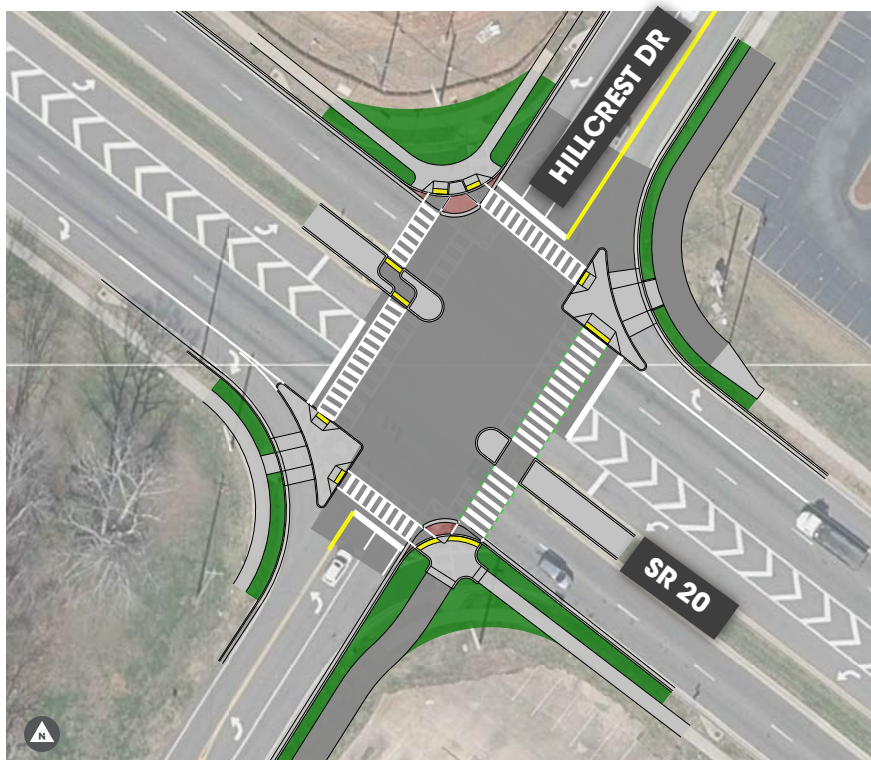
SR 20 and Hillcrest Dr Intersection Concept
